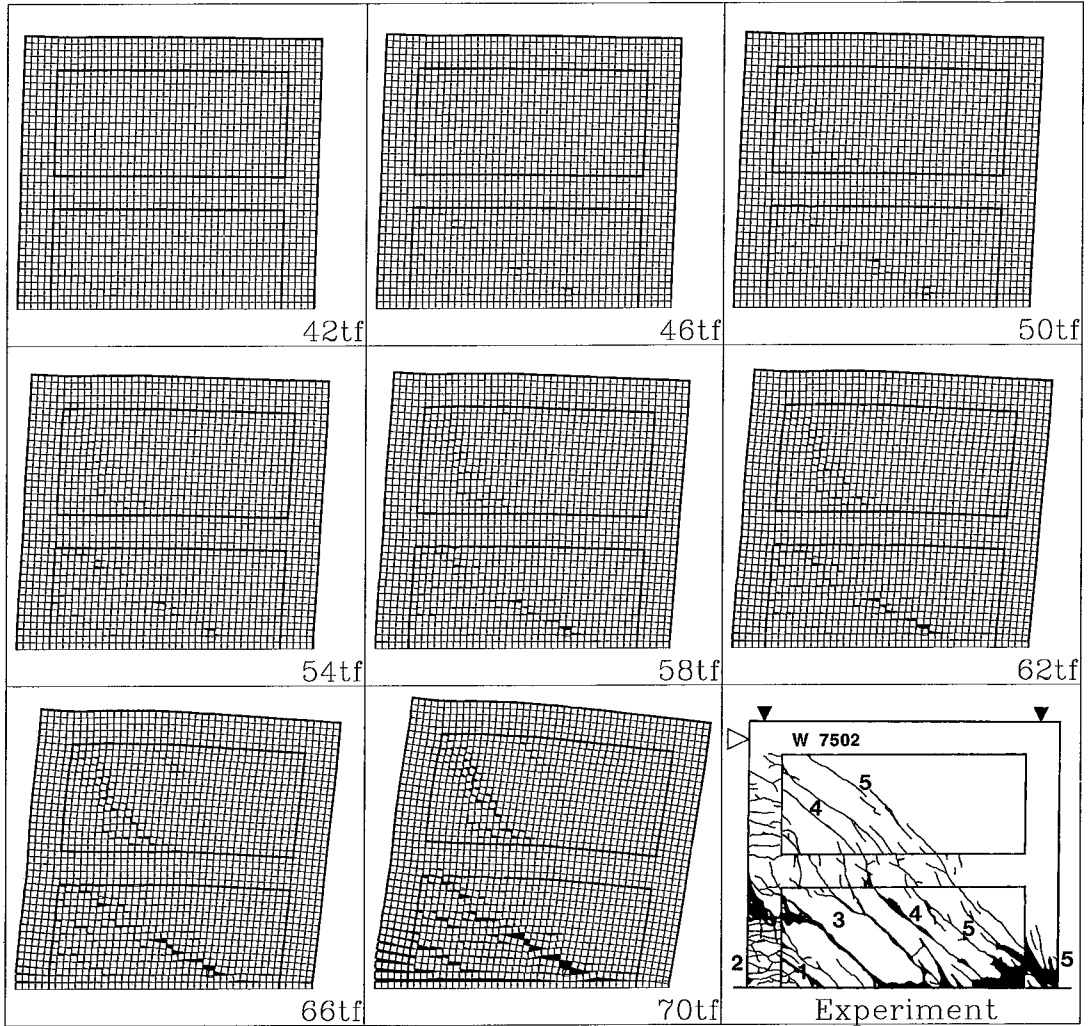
Deformed shape and crack locations of the 2-storied RC wall structure
